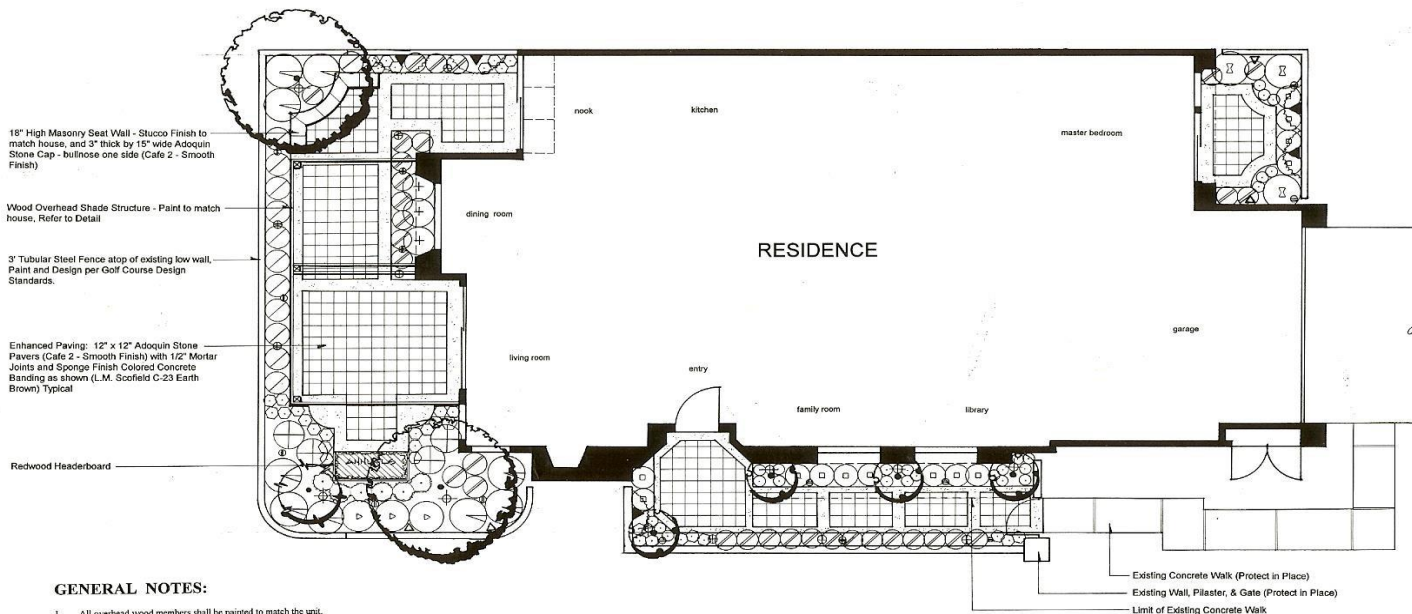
EXHIBIT E SAMPLE LANDSCAPE PLAN SUBMITTAL DOCUMENT
